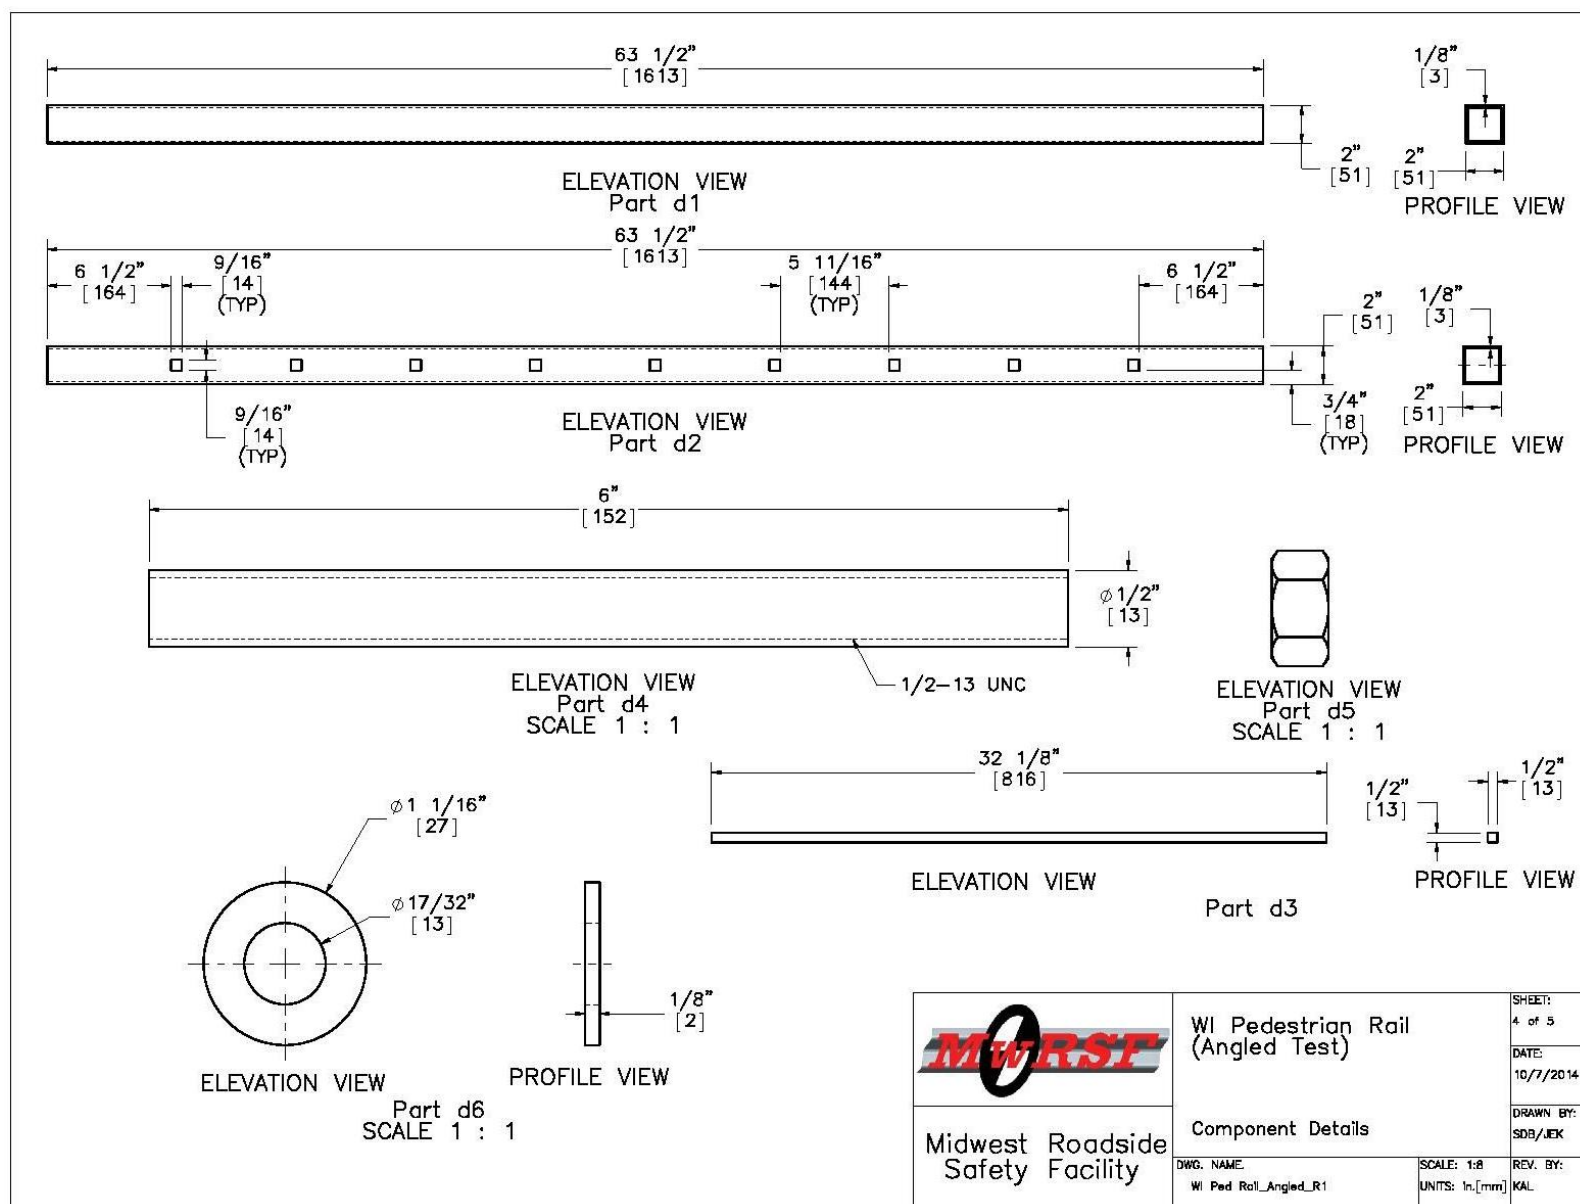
Component Details, Test Nos. APR-1 and APR-2
